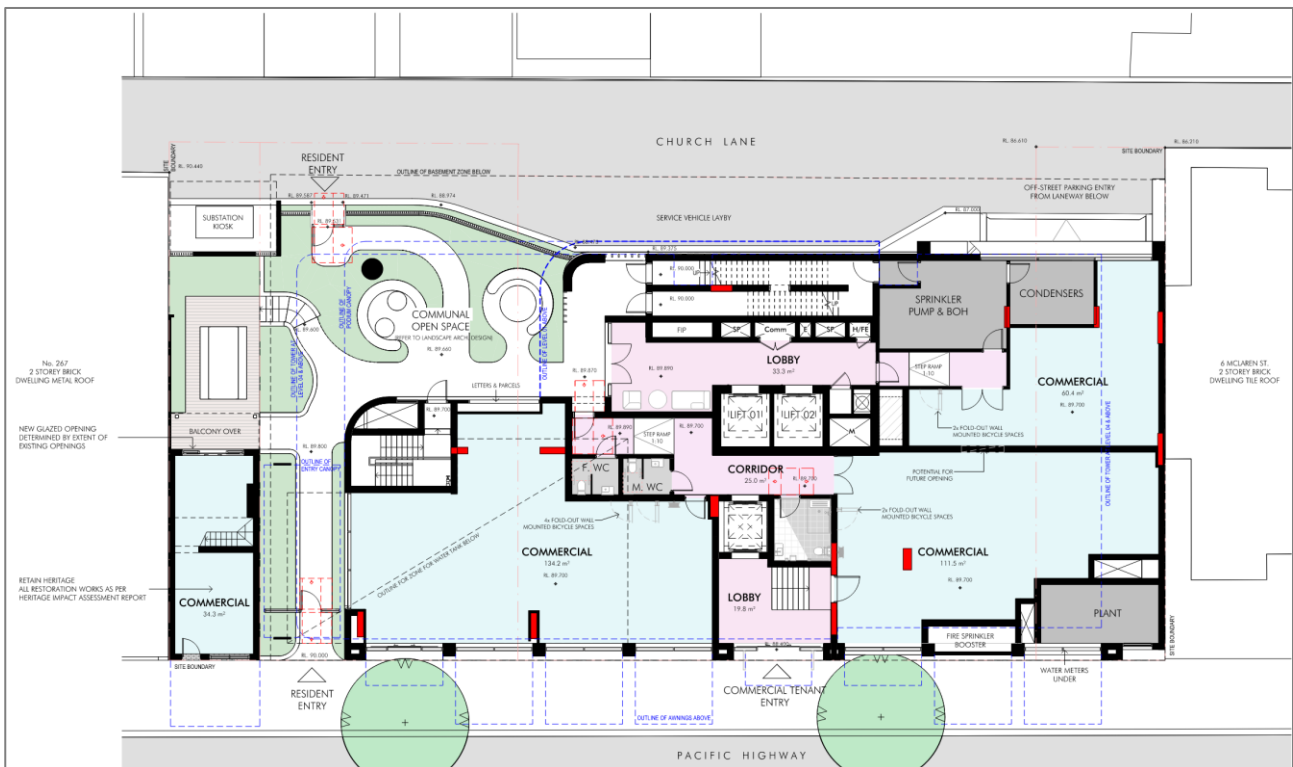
Arch Ground Floor Layout (Source 14344: Ground Floor Plan by Nettleton Tribe, dated 13 June 2025).
